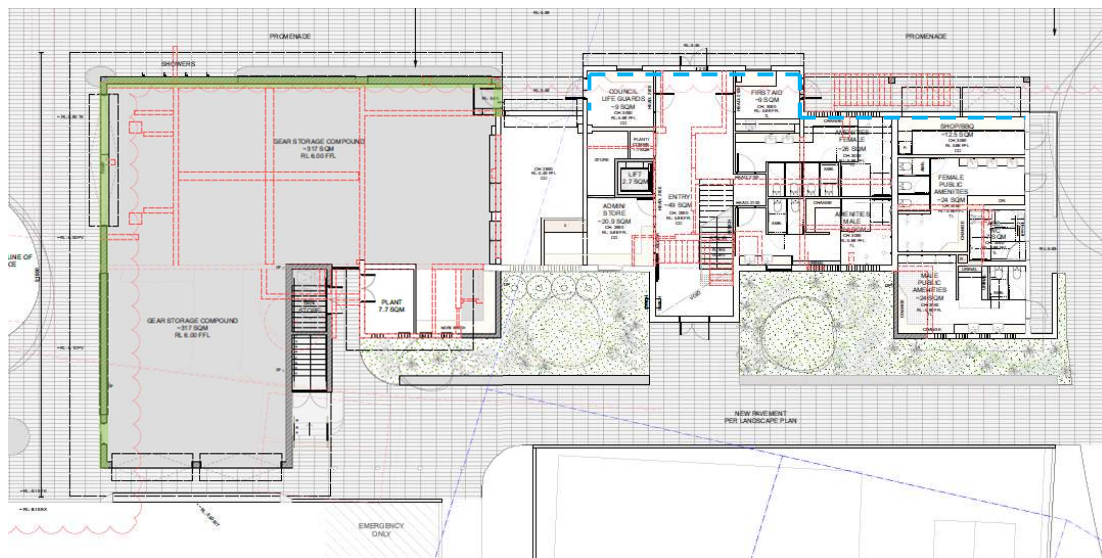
Proposed ground Floor layout. Location of structurally strengthened (new) walls shaded green. Structural augmentation to inside of significant fabric overlay NBRS existing walls dashed blue. In providing strengthening to the interior of the historic structure retains the original fabric and presentation of the building whilst putting in place strengthening measures to meet coastal protection requirements. (Source: Andriano Pupilli Architect, structural identification overlay NBRS)
